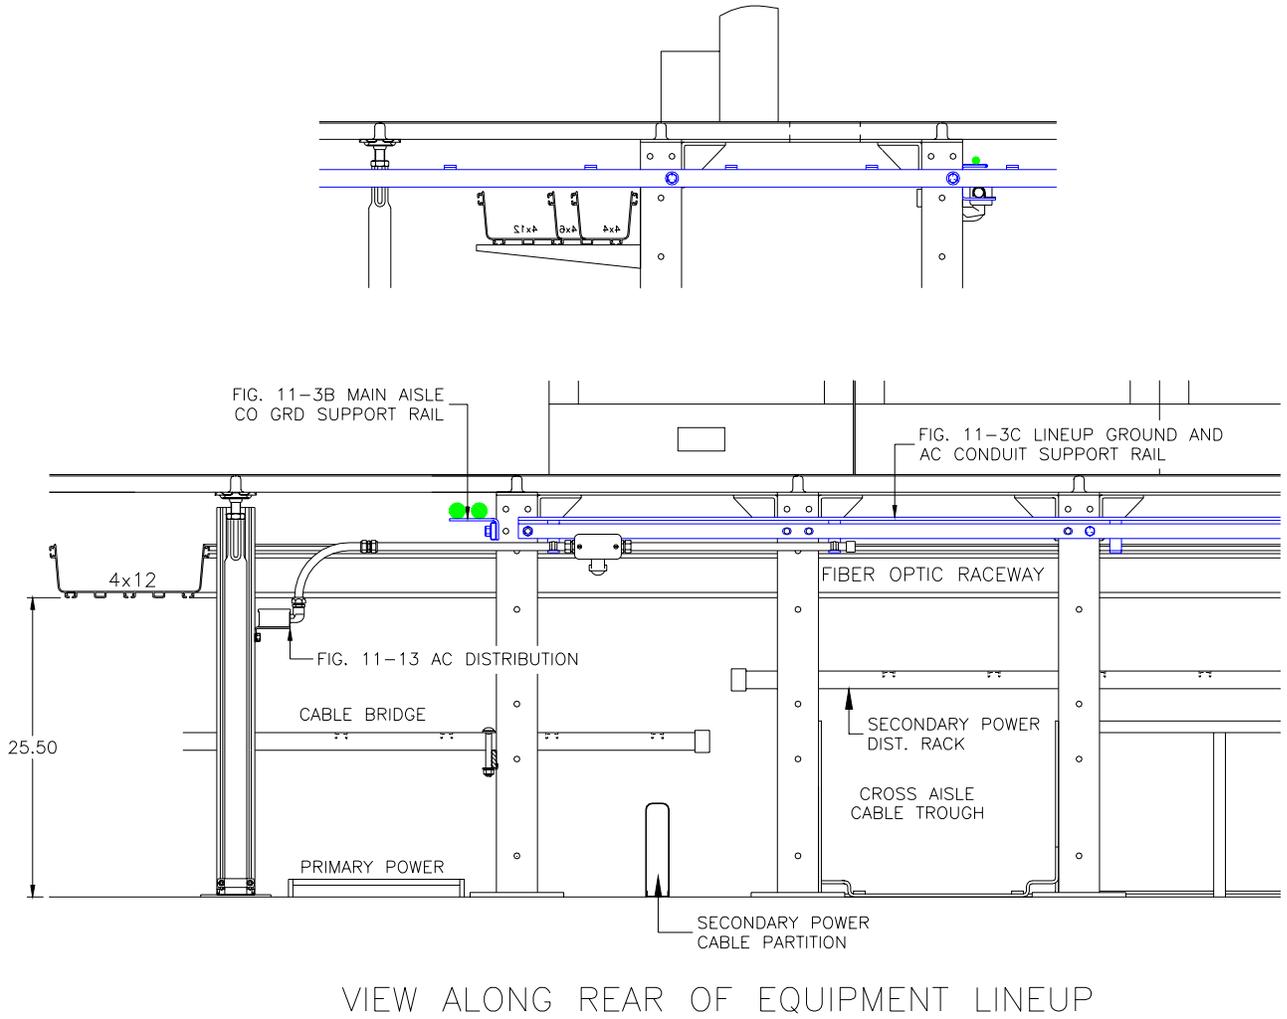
A – Support Of AC Conduit and CO Ground Conductors
